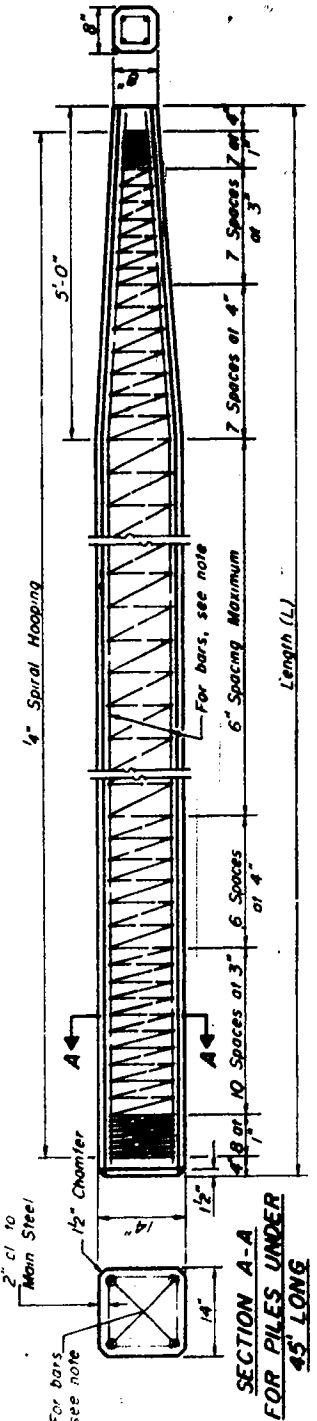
DETAIL OF PRECAST PRESTRESSED CONCRETE PILES
